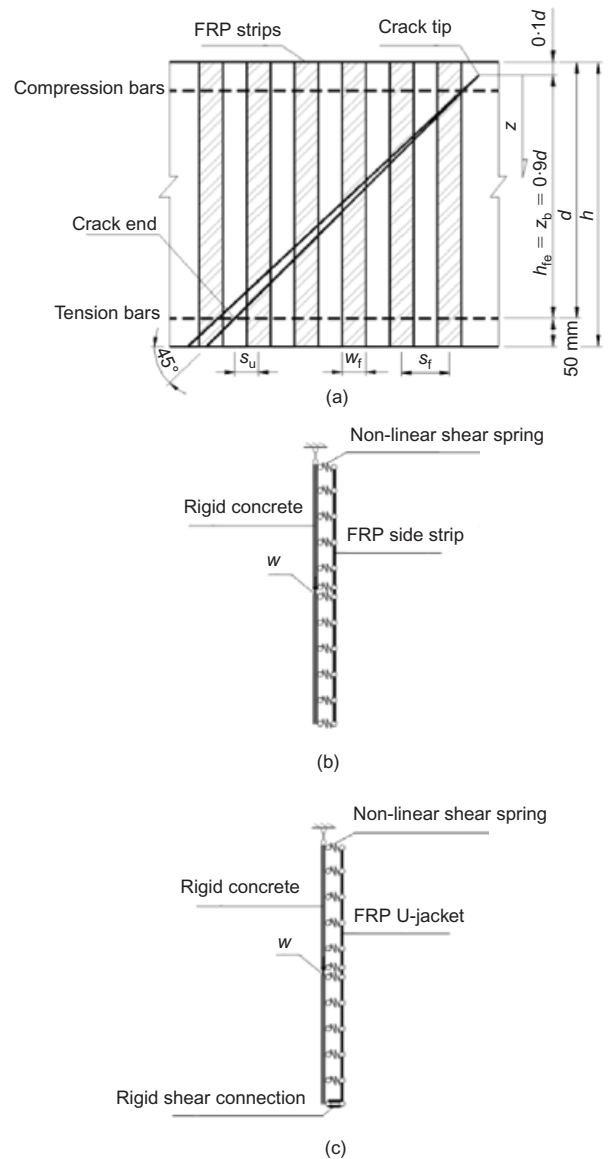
Computational model for RC beams shear-strengthened with FRP strips: (a) elevation ($s_{f,1}$: spacing from the crack end to the centre of the first FRP strip; s_f : centre-to-centre spacing of FRP strips; w_f : width of individual FRP strips); (b) FRP side strips; (c) FRP U-jacket
